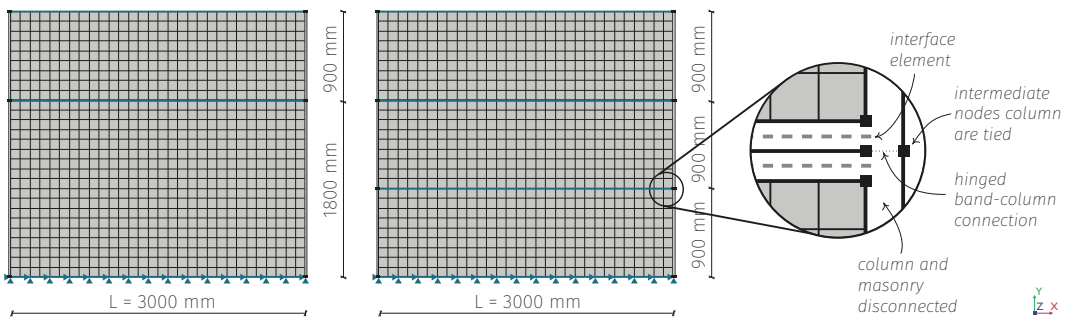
Overview of the numerical model of the masonry wall confined by two columns, and a roof, floor and lintel band (left) and a roof, floor, lintel and sill band (right).
